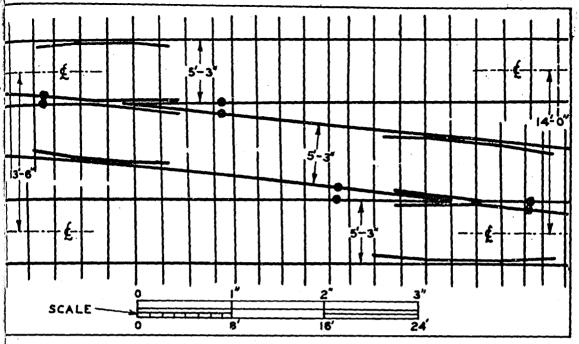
PORTION OF TIMBER PLAN - SCALE: 8-0"TO 1"
